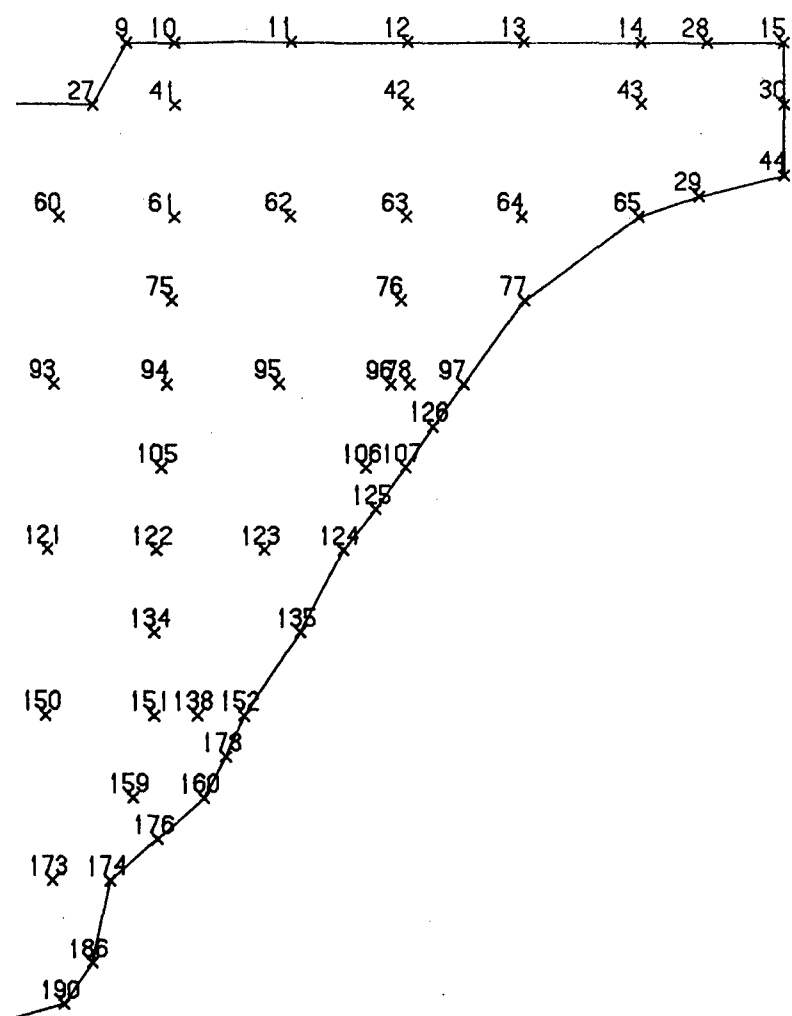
DEVELOPED VIEW OF DOWNSTREAM FACE, LOOKING UPSTREAM
